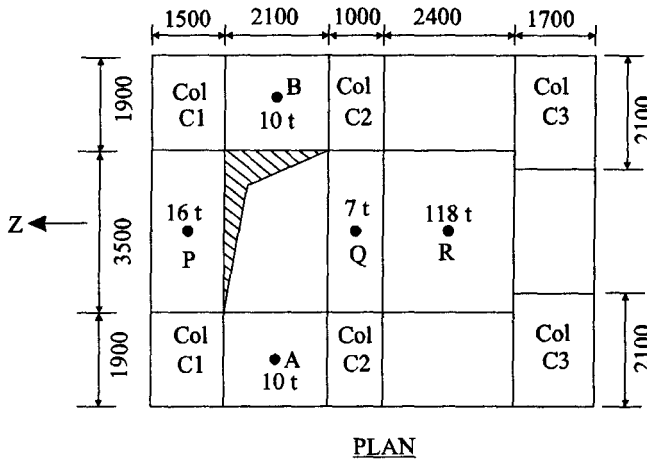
Foundation Plan - Frame III Columns Modified
